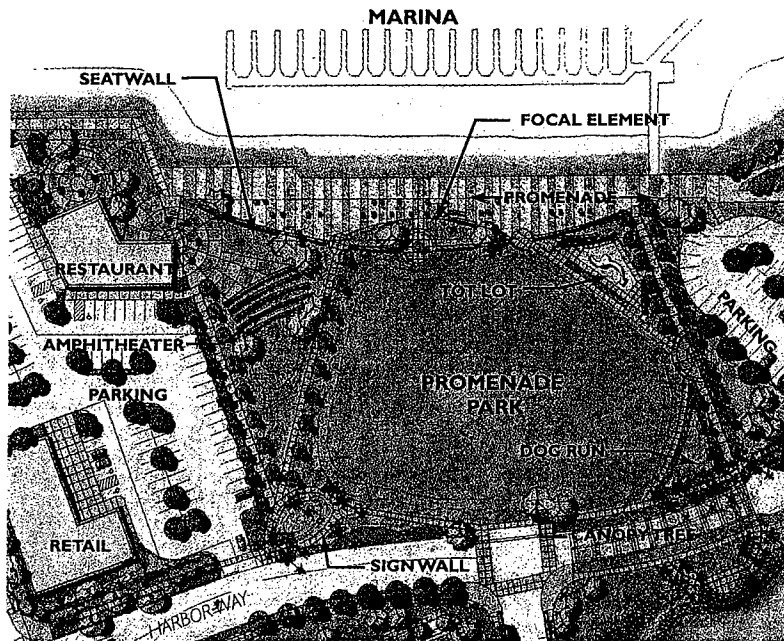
D.17: Illustrative Site Plan of Promenade Park
